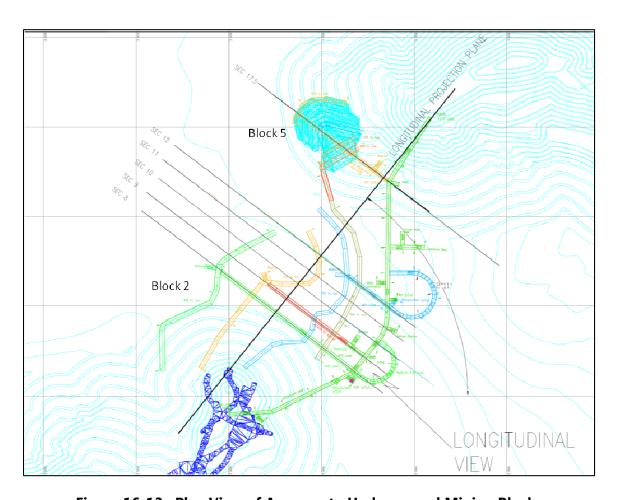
Plan View of Accesses to Underground Mining Blocks
